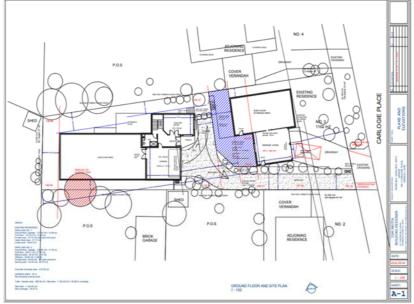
Ground Floor and Site plan, showing the proposed dwelling to the left of page
